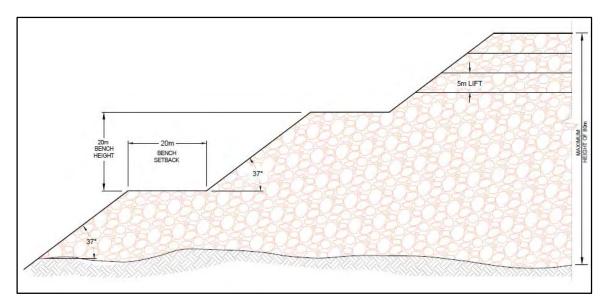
Typical Cross Section of the Whale Tail Waste Rock Storage Facility
